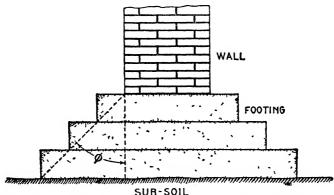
,358.—Angle for foundation footing. In ordinary practice the footing courses upon which the walls of the building proper rest, consist of blocks or slabs of stone as large as are available and convenient to handle. Footings of brick or concrete are also used in very soft soils; footing consisting of timber grillage are often employed. A grillage of iron or steel beams has also been used successfully. The inclination of the angle of footing should be about as follows for metal footings, 75°, for stone, 60°, for concrete, 45°, for brick, 30°. Damp proof courses of slate, or layer of asphalt are laid in or on the foundations or lower walls to prevent moisture arising or penetrating by capillary attraction.
